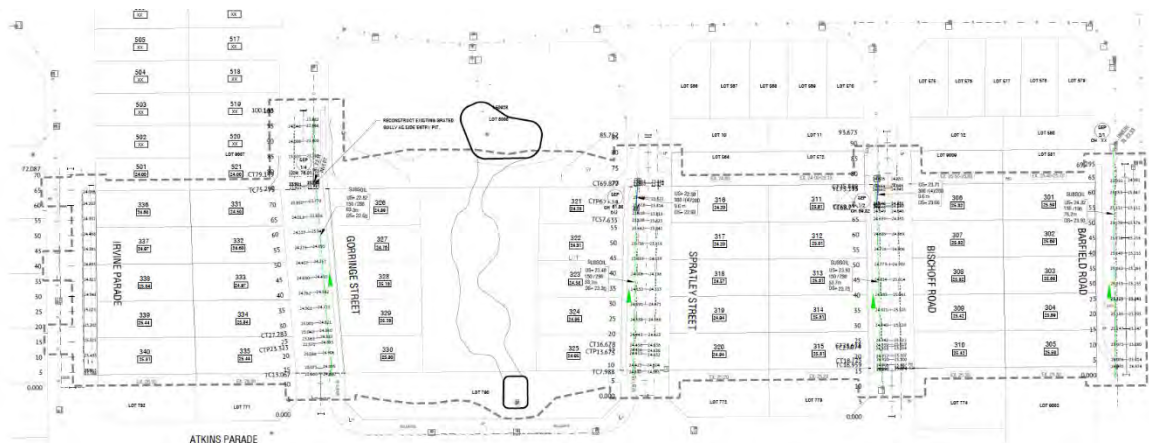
Stormwater Drainage Strategy – 116 Barfield Road, Hammond Park
